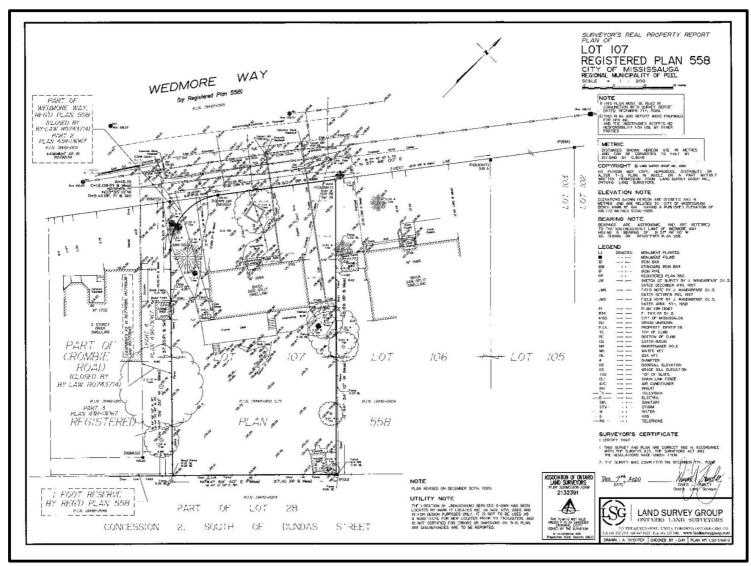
Subject Property – Existing Site Plan (H4H Inc. 2021)
